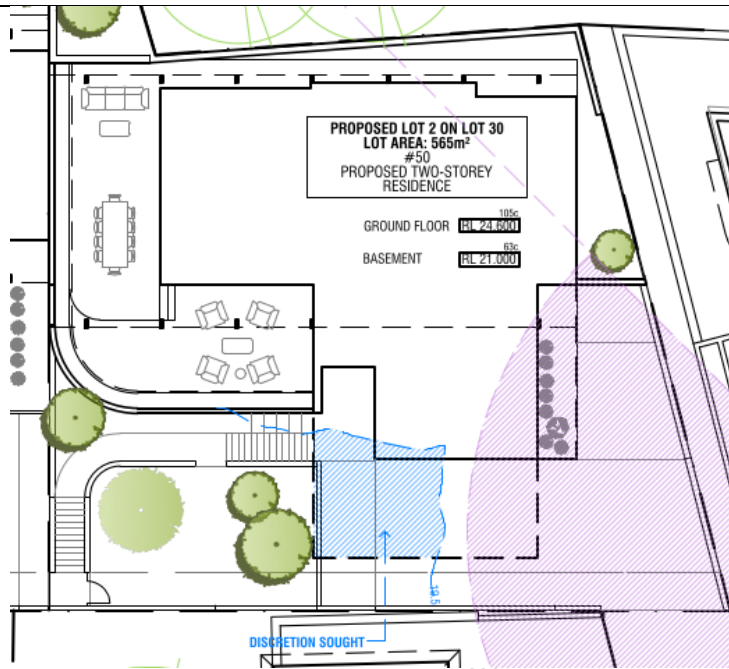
Unit 2 Floor Plan with Blue Area Showing Bed 1 Roof Over 9m.
